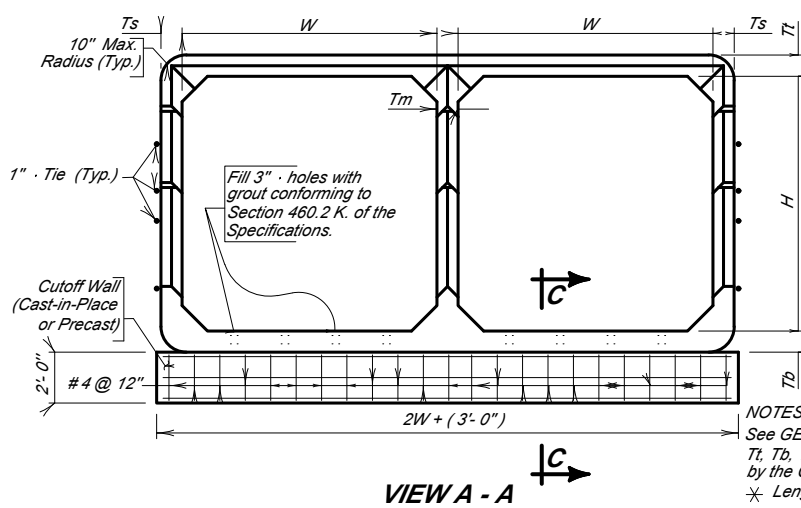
CULVERT-PRECAST DOUBLE BOX WITH SLOPED END-2' CUTOFF WALL
